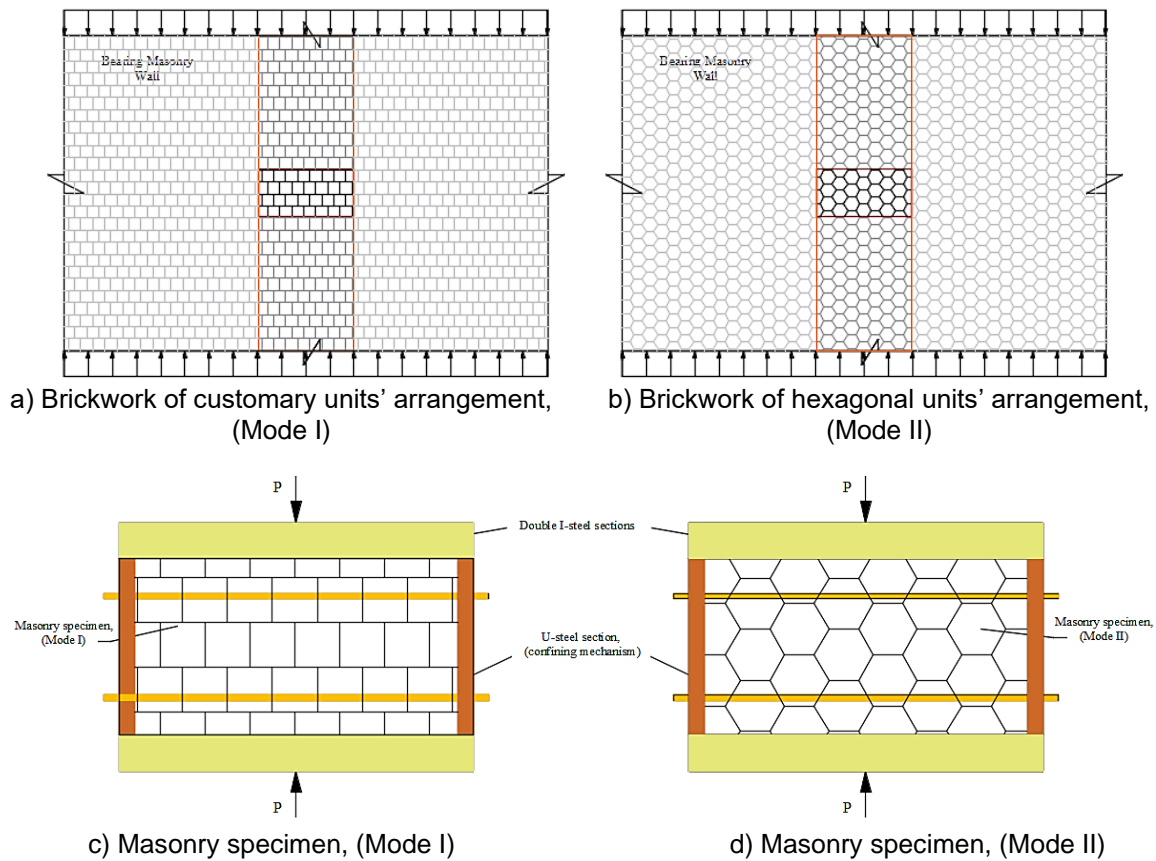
Specimens modeling based on plan strain concept and Saint Venant's principle.
